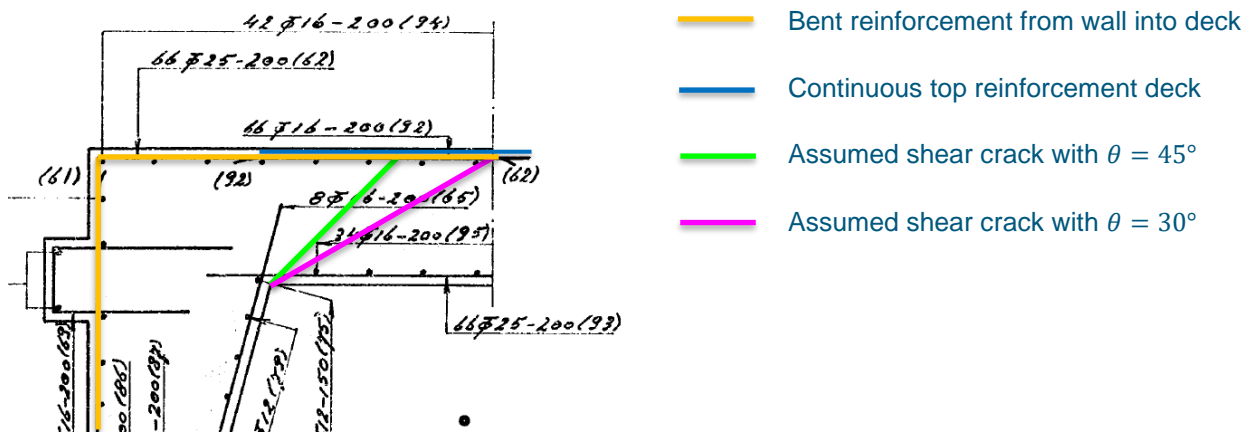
Detail of reinforcement in connection between wall and deck of structure DATA-021
